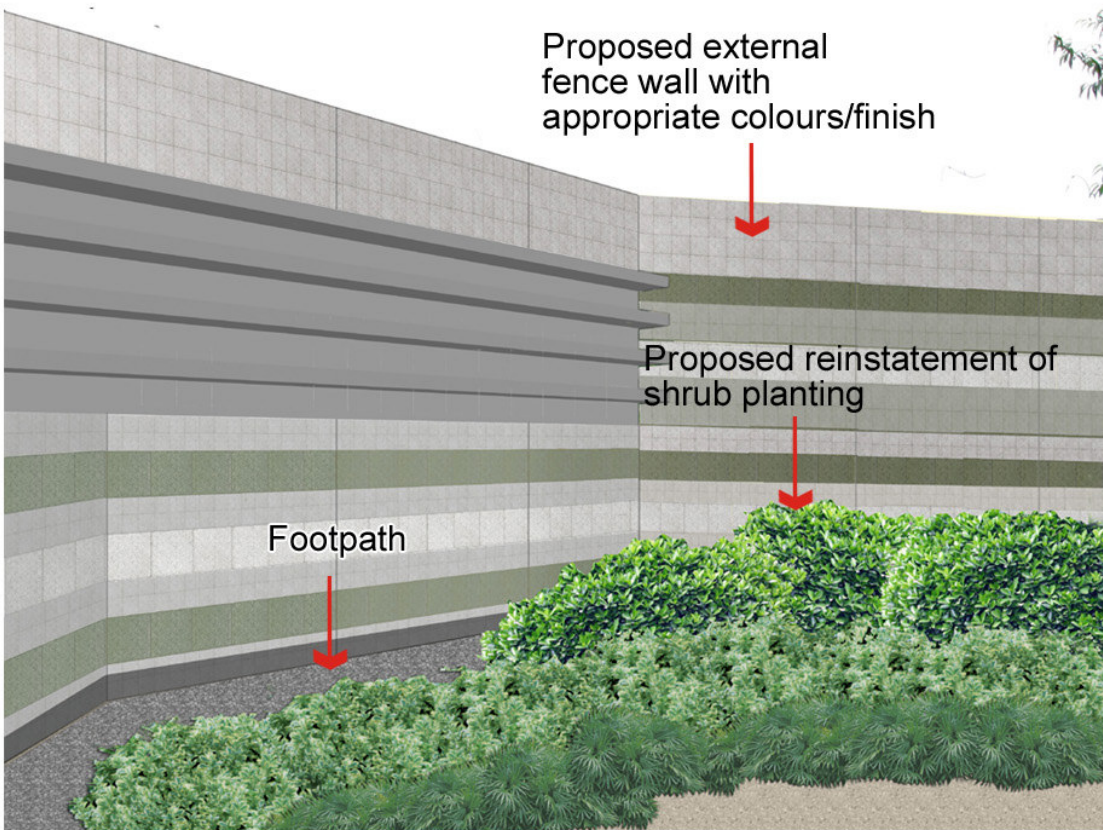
Proposed building and fence wall with mitigation measure - Day 1
